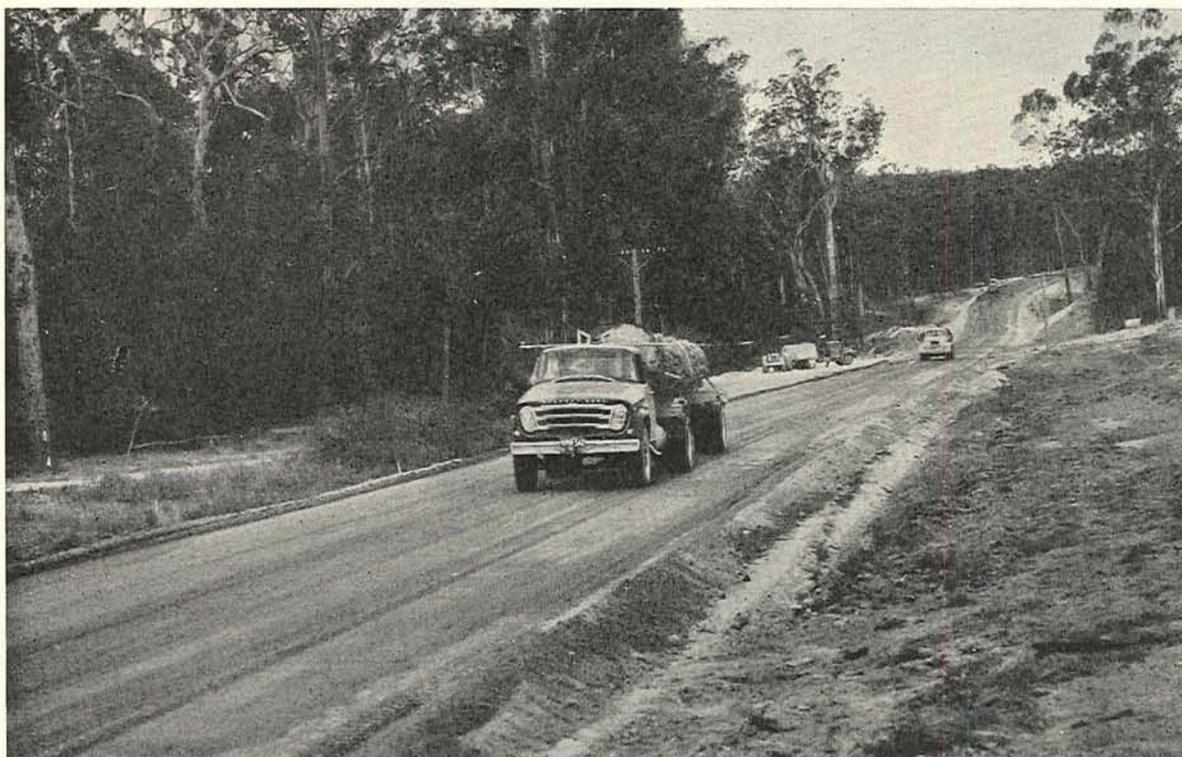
Tambo Shire—Bruthen–Buchan Road.
